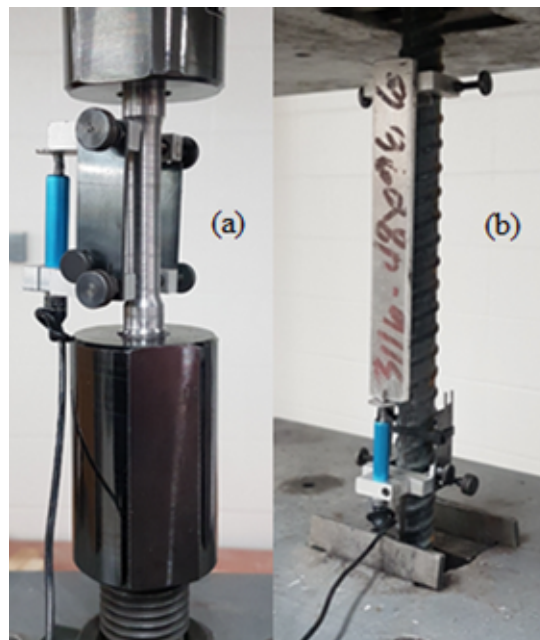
Tensile test coupon and length in the same Universal Testing Machine: (a) plain reinforcement, and (b) modern deformed reinforcement
